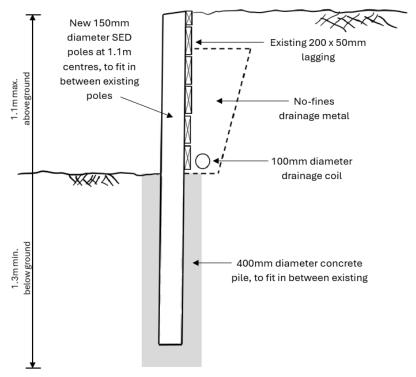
Structural Engineer detail for the strengthening and addition to the original retaining wall (not to scale)
